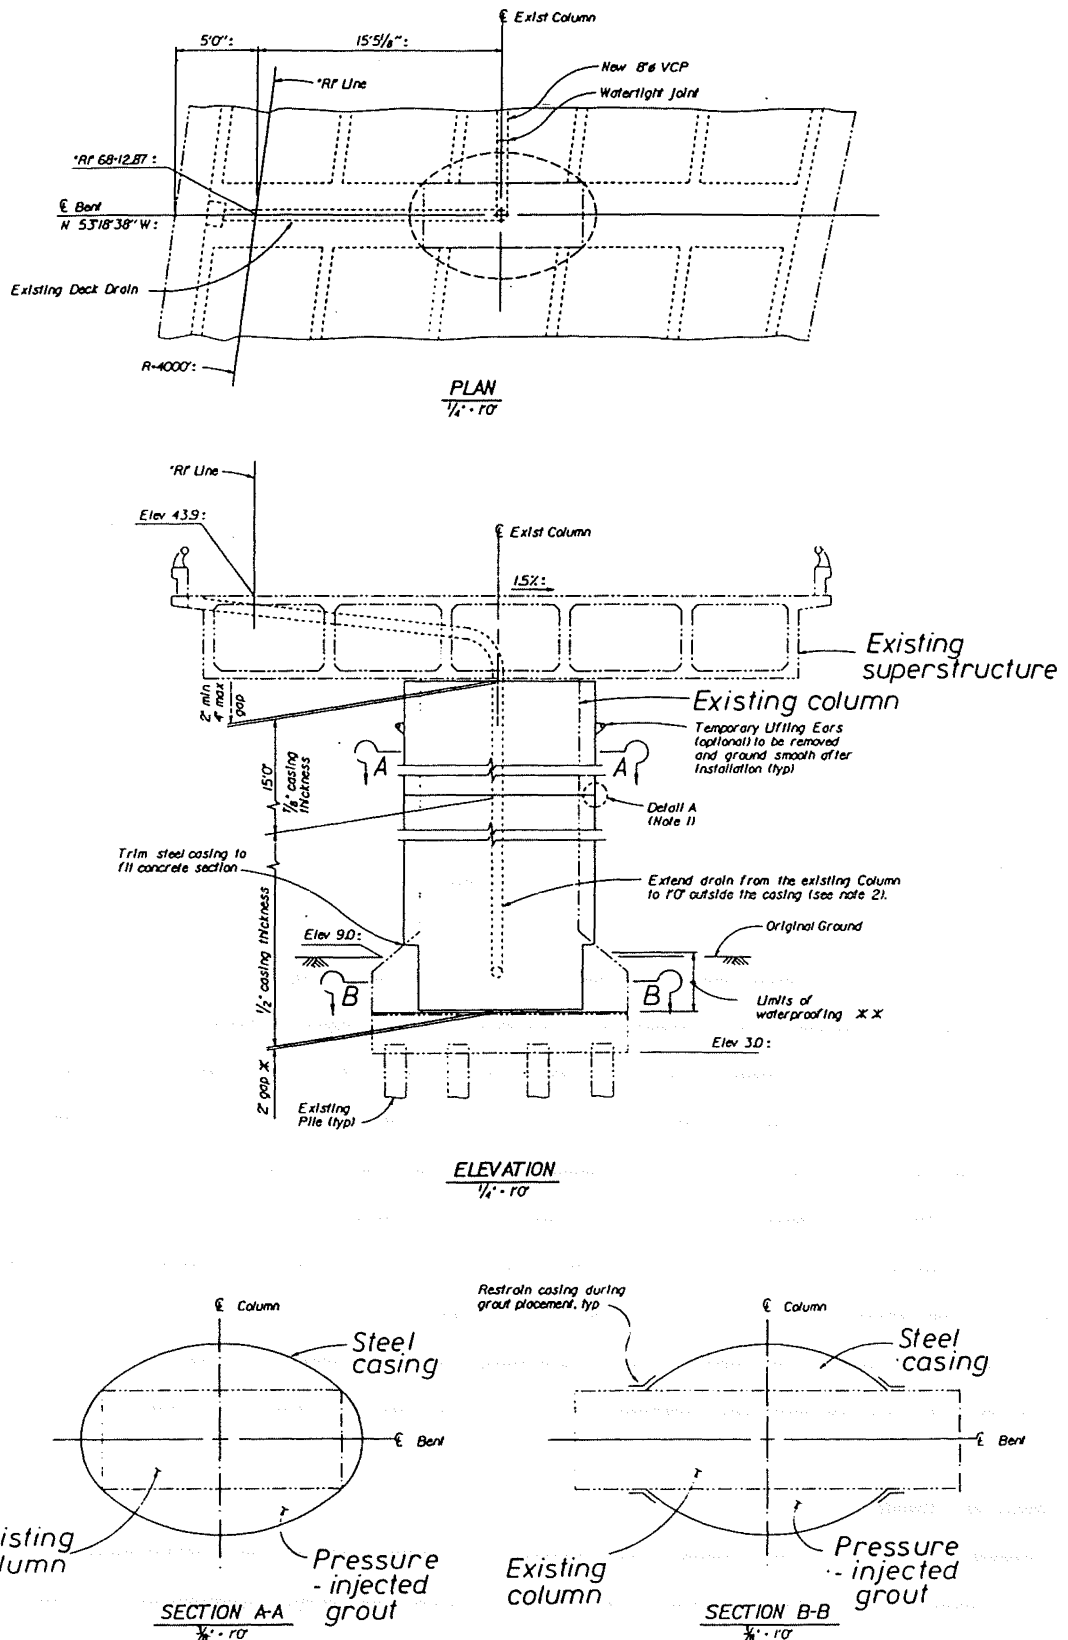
Elliptical steel jacketing retrofit of a single-column pier having a rectangular column section [Zelinski 1993].
